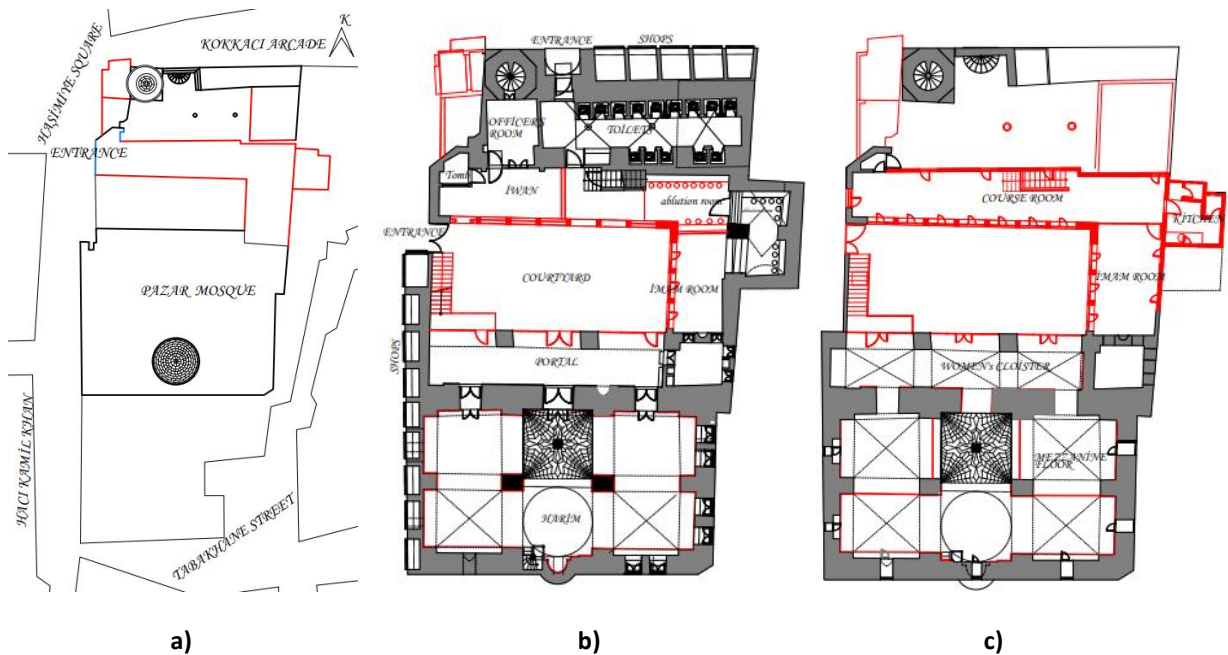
a. The layout plan (the year 2012) b. Ground floor plan c. First floor plan (Dağtekin Archive, 2023)
